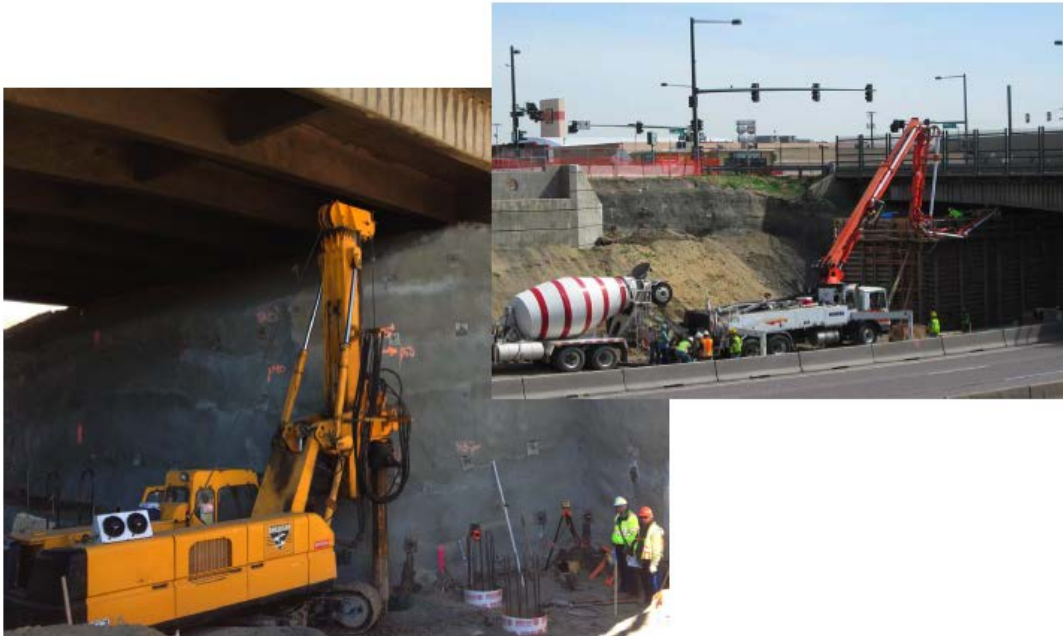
Photos. Abutment construction under existing bridge (courtesy: Colorado DOT).
